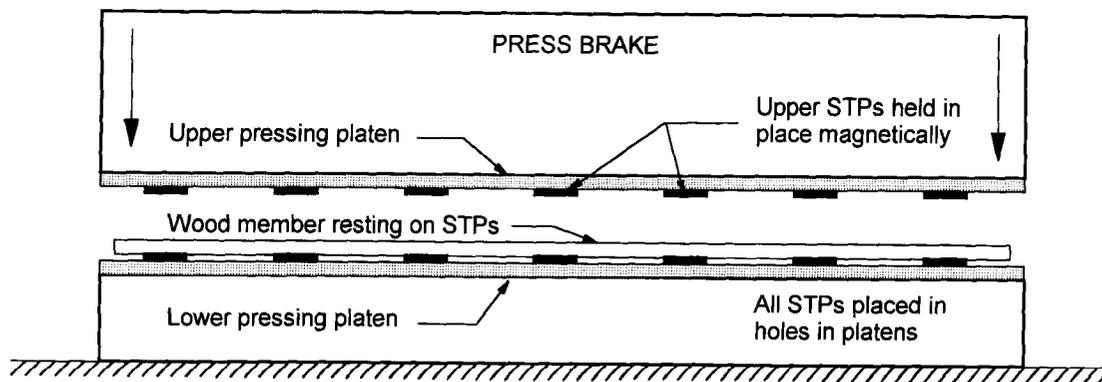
Use of press brake to install plates in center layer of STP-laminated girder.
